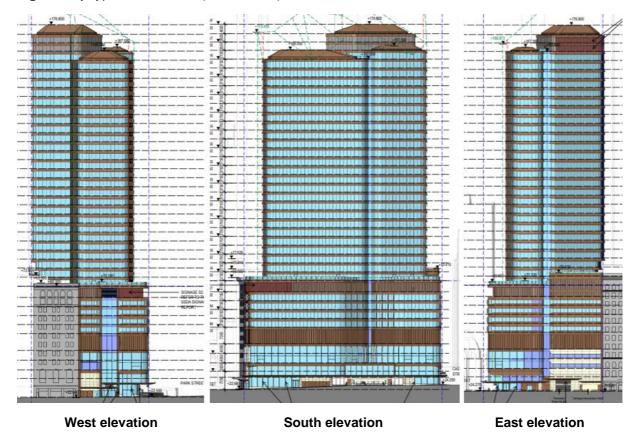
| Elevation drawings of detail SSD application (Source: RtS)
